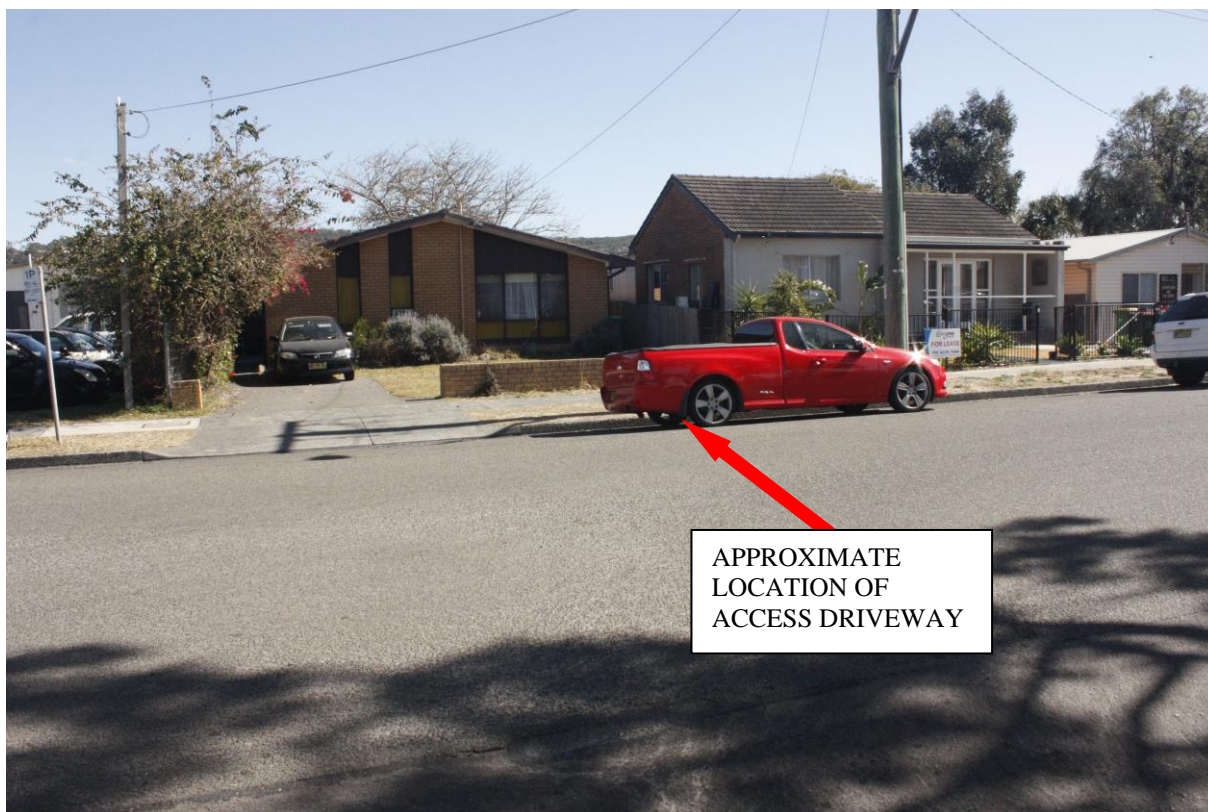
Looking generally west across Alfred Street showing the existing dwelling at No. 3 Alfred Street with the proposed vehicular access along the right-hand side of the property.
